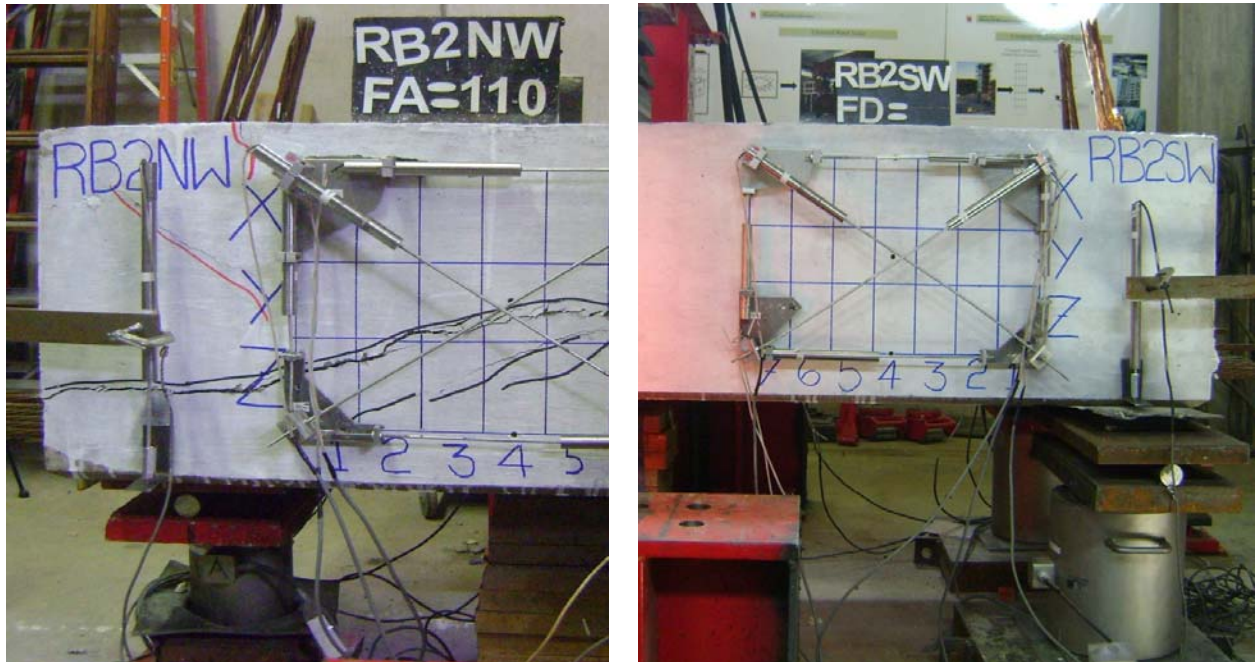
Loading Assembly for PSFC Box-Beams
